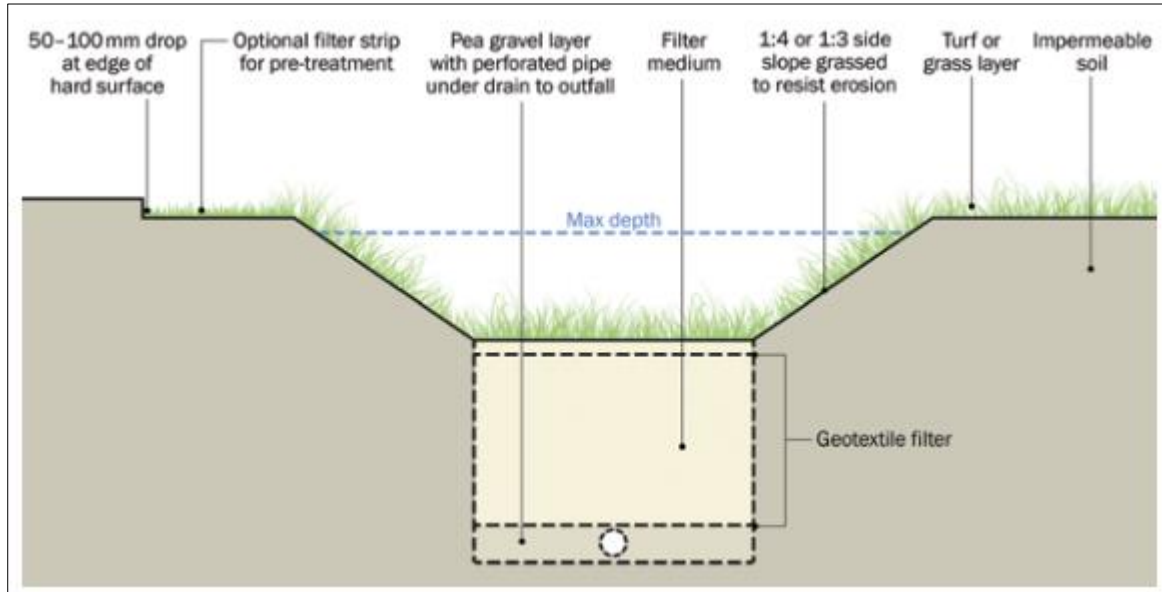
Typical Cross Section of dry swale/bioretention area (Extract from CIRA SuDs Manual)
